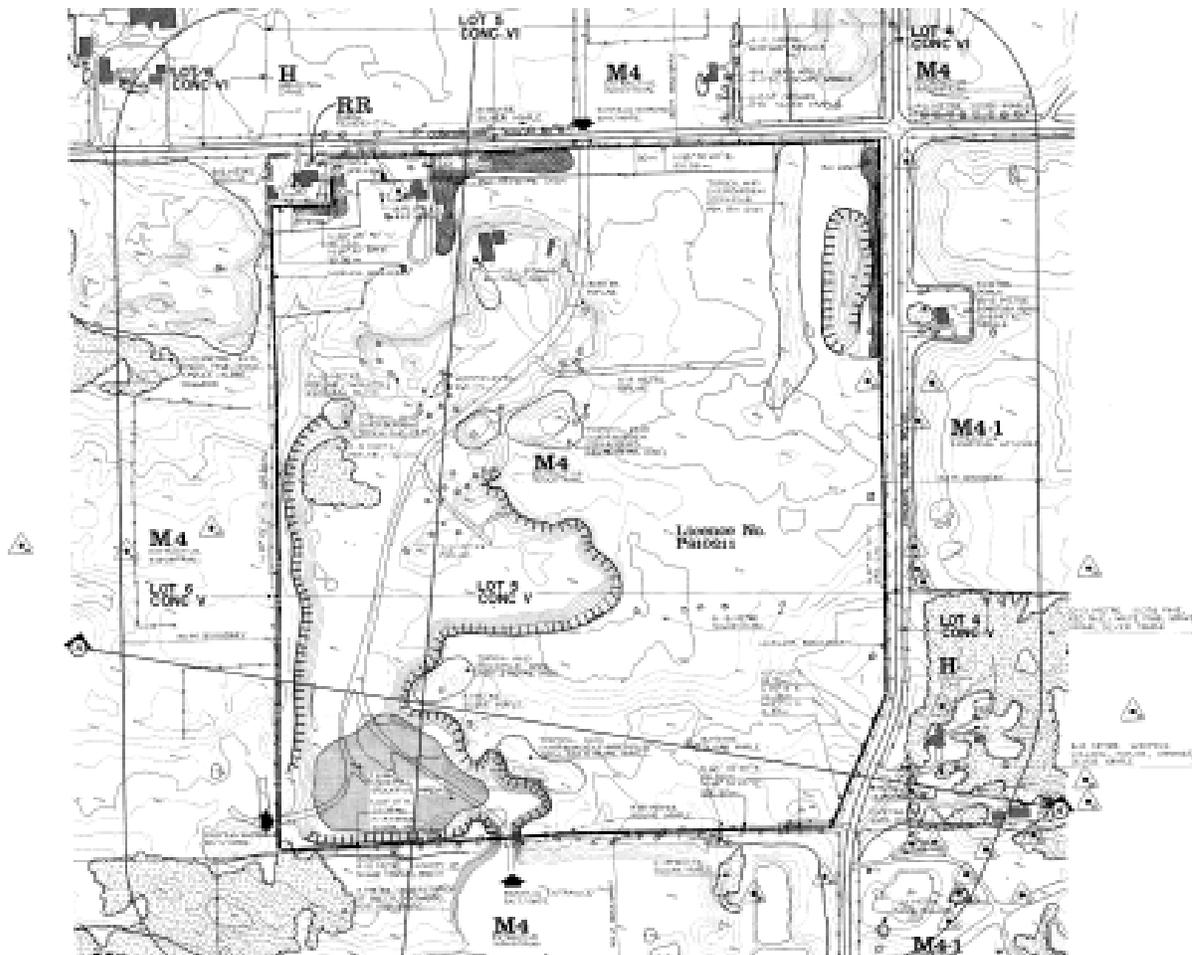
ARA approved site plan for proposed extension of Talbot Pit (Source: Harrington and Hoyle Ltd., March 1993)
